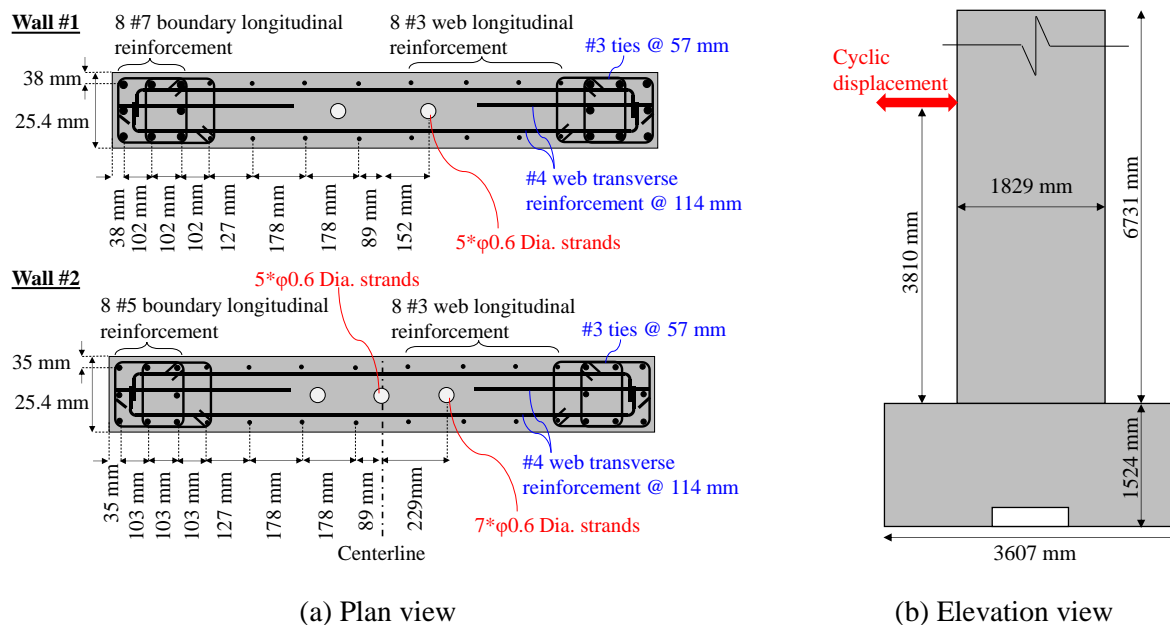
Reinforcement details and geometrical configuration of post-tensioned walls tested by Pakiding et al. (2014).
